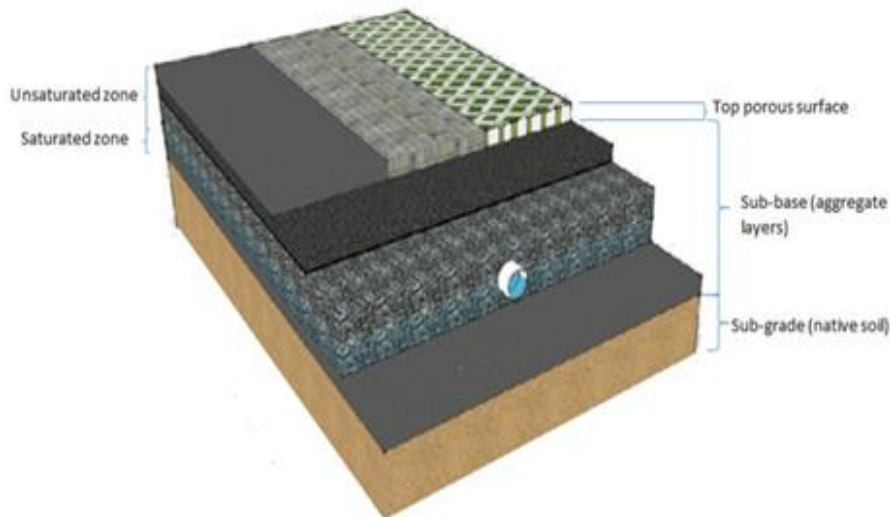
Typical permeable pavement (Upeka et al., 2019)
